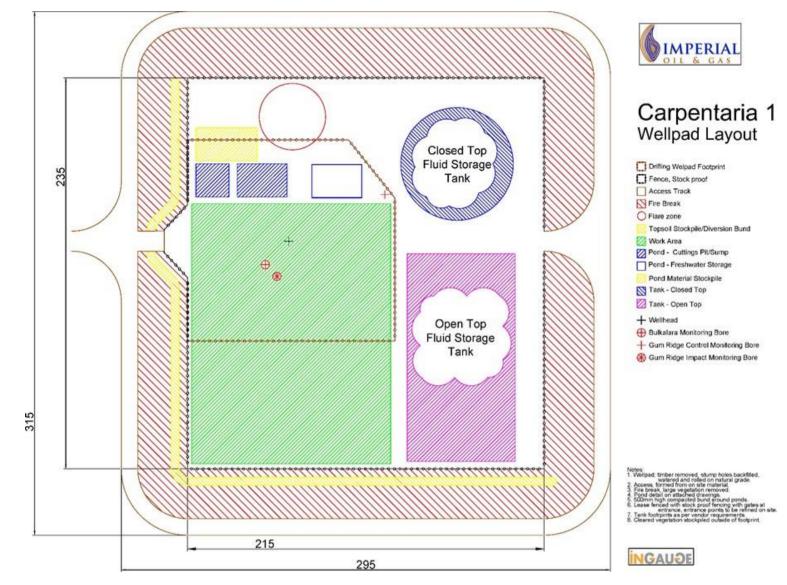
Carpentaria 1 Wellpad footprint with indicative tanks layout
